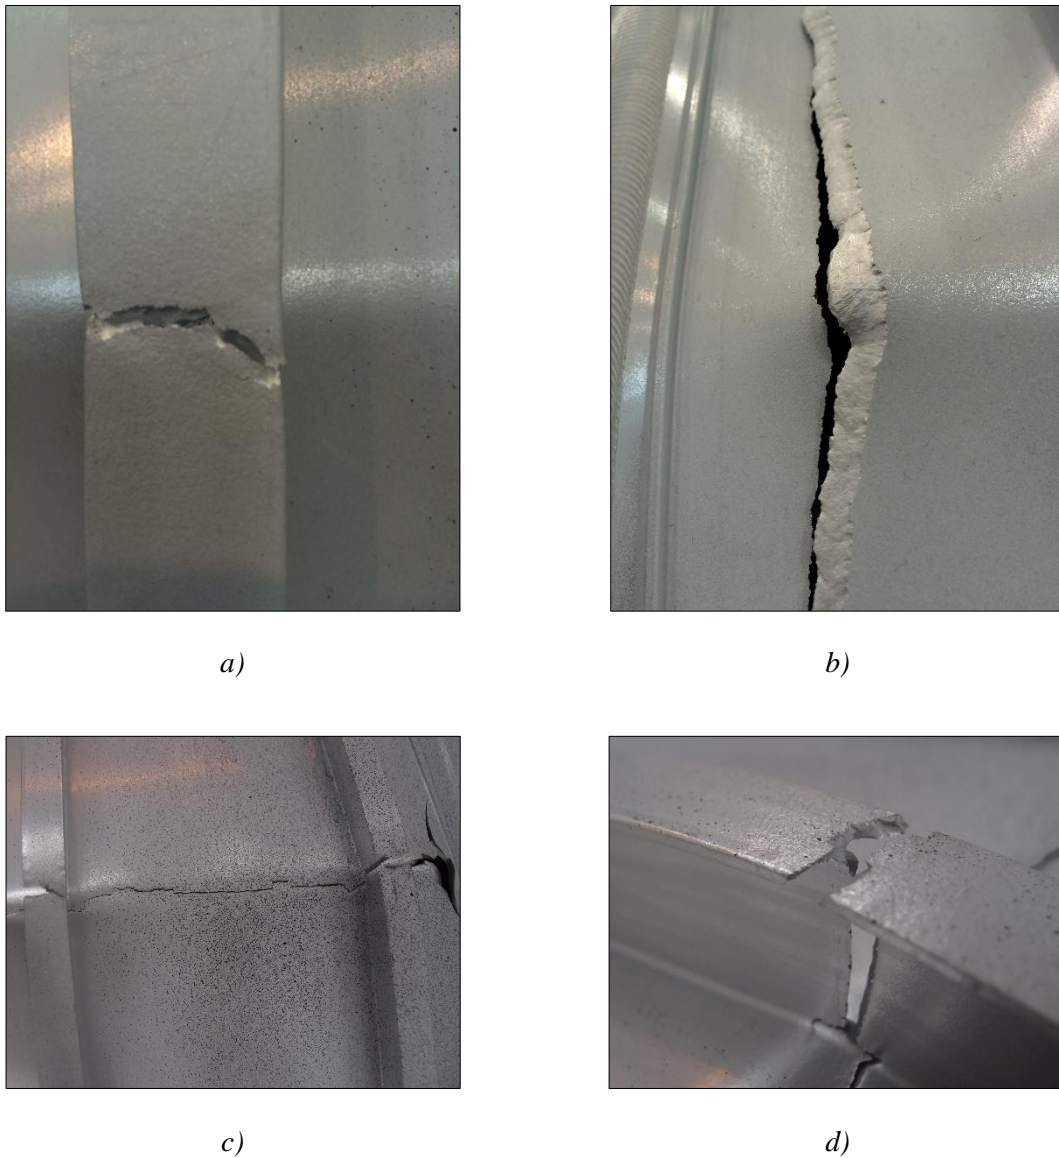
a)-d): Fracture in plate with transversally placed indenter. a) QSTE1: Fracture in stiffeners. b) QSTE1: Fracture in plate c) QSTE2: Fracture in plate d) QSTE2: Fracture in stiffener.
